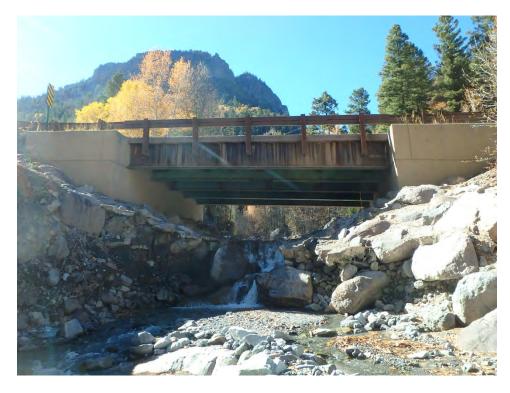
Overview of channel headcut in 2017 (from previous inspection report)
